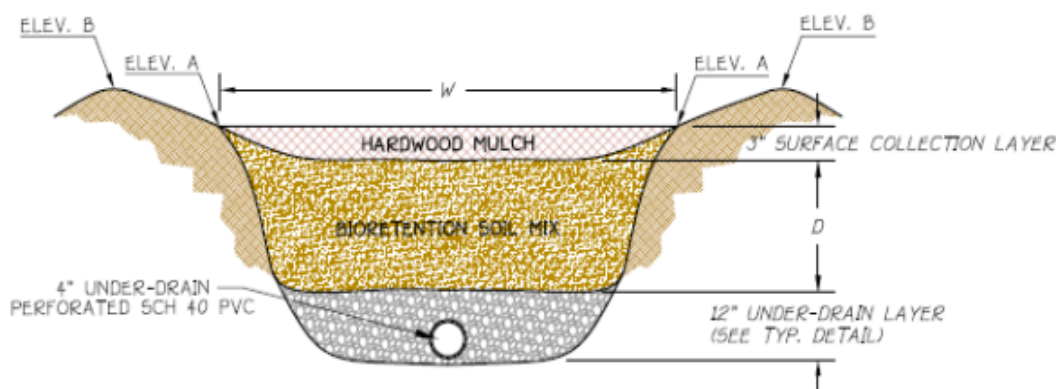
A Cross section of a Bioretention facility (Bioretention facility) *Not to Scale
